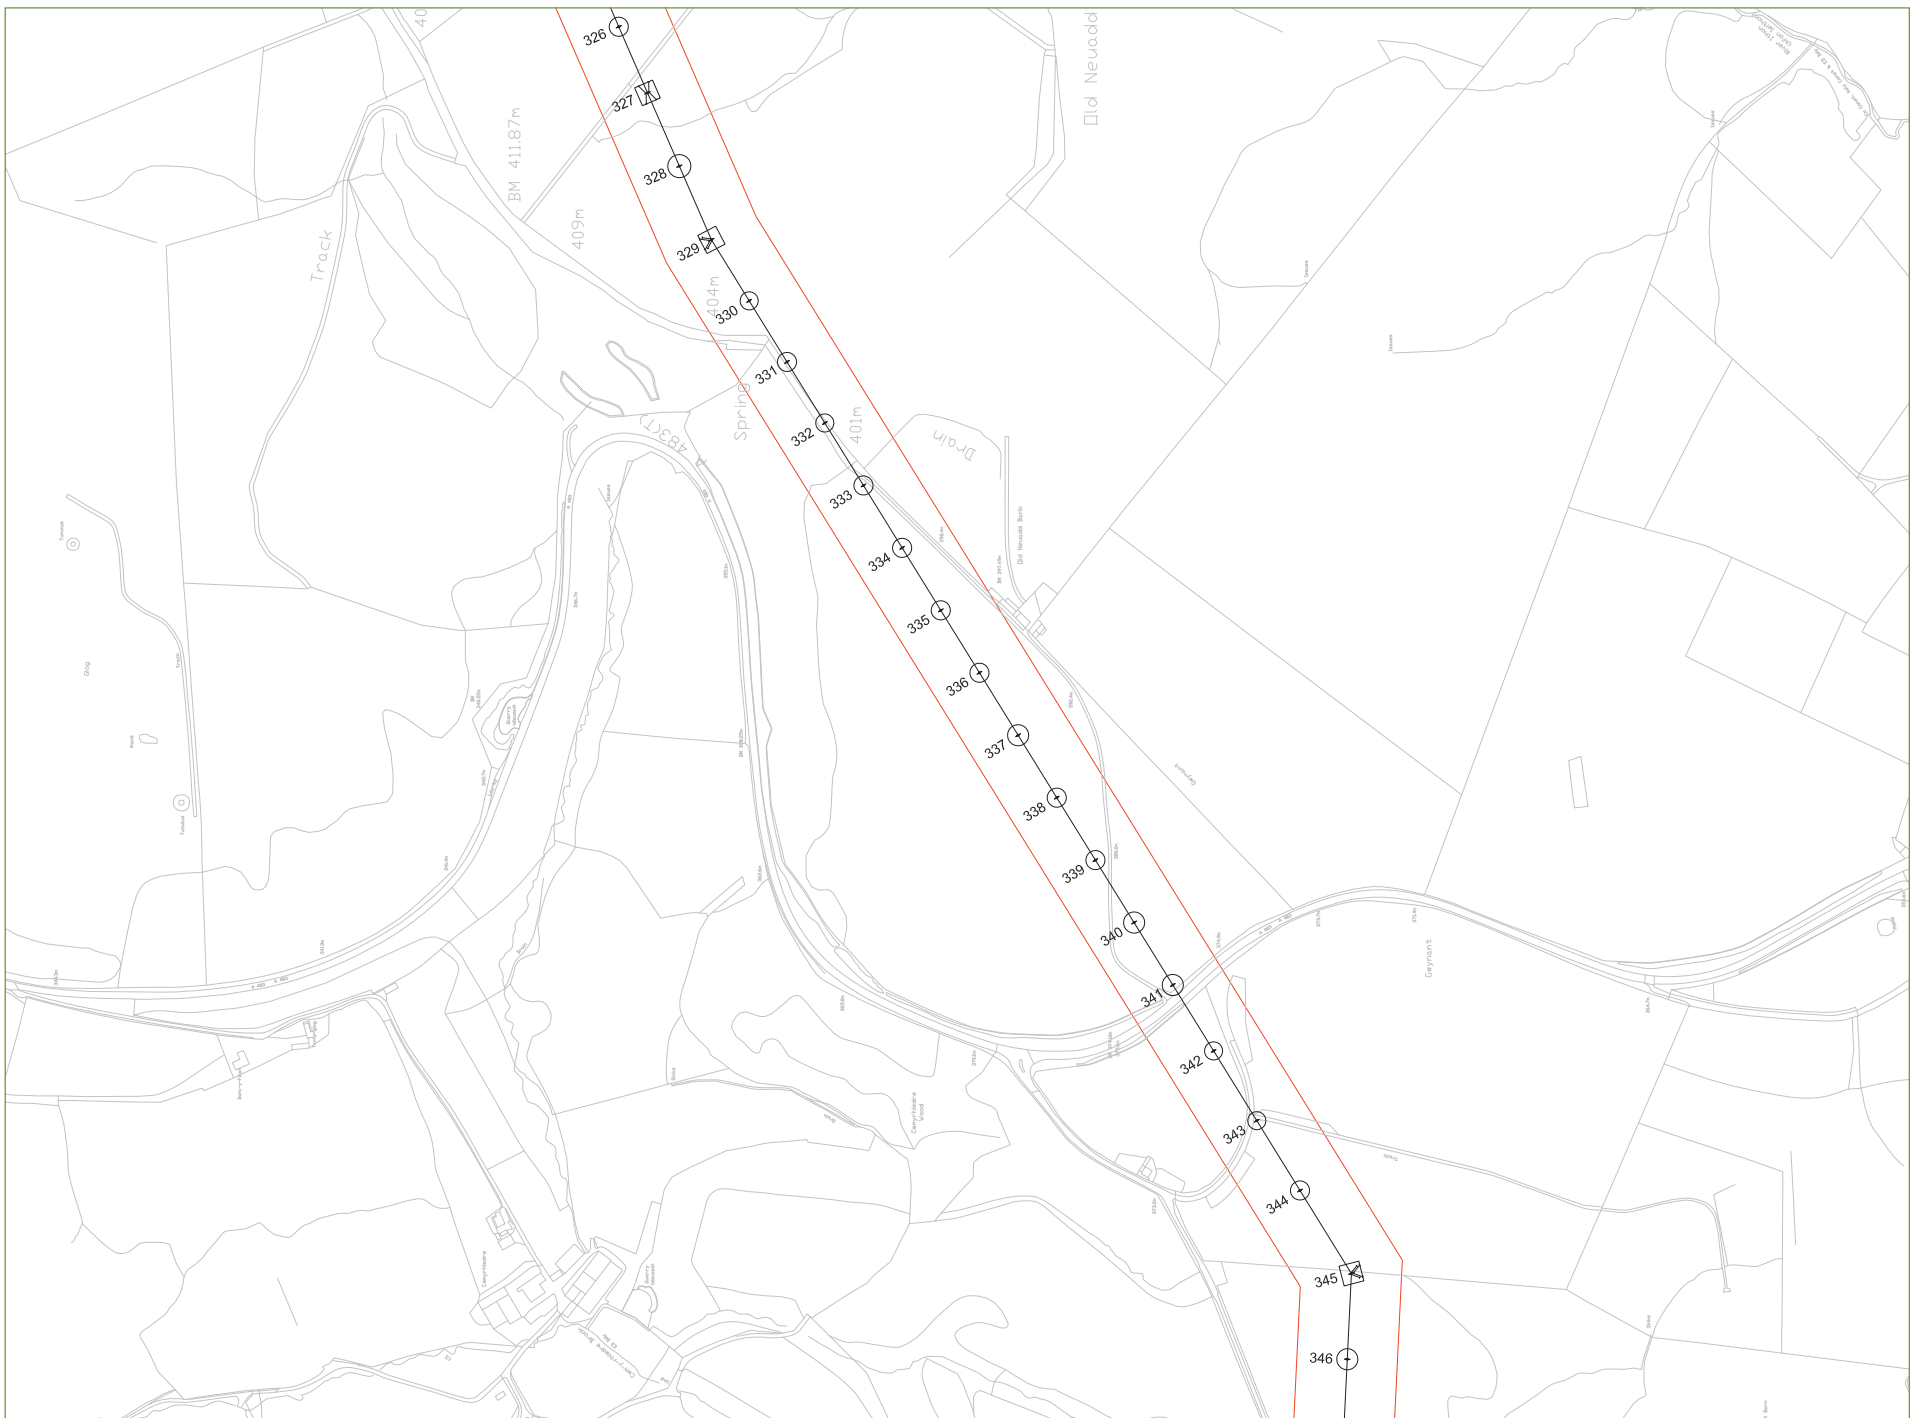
Hedgerow Plan Sheet 17 of 20
